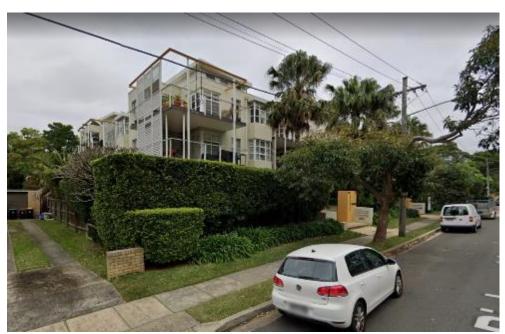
19-23 Richmond Avenue opposite the site to the east is a contemporary residential flat building with recessed building elements that breach the building height plane.
